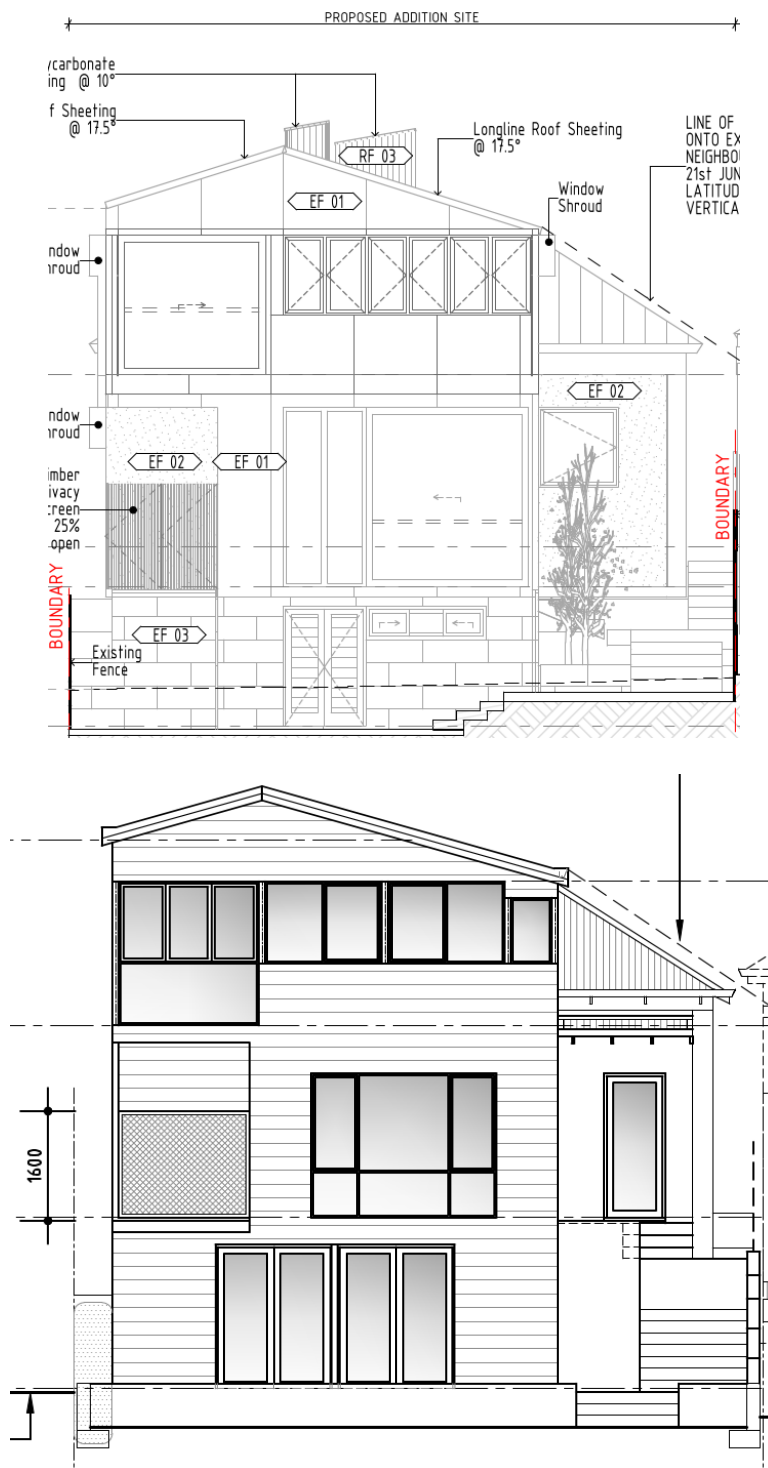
Approved North Elevation (top) and Amended North Elevation (bottom).
